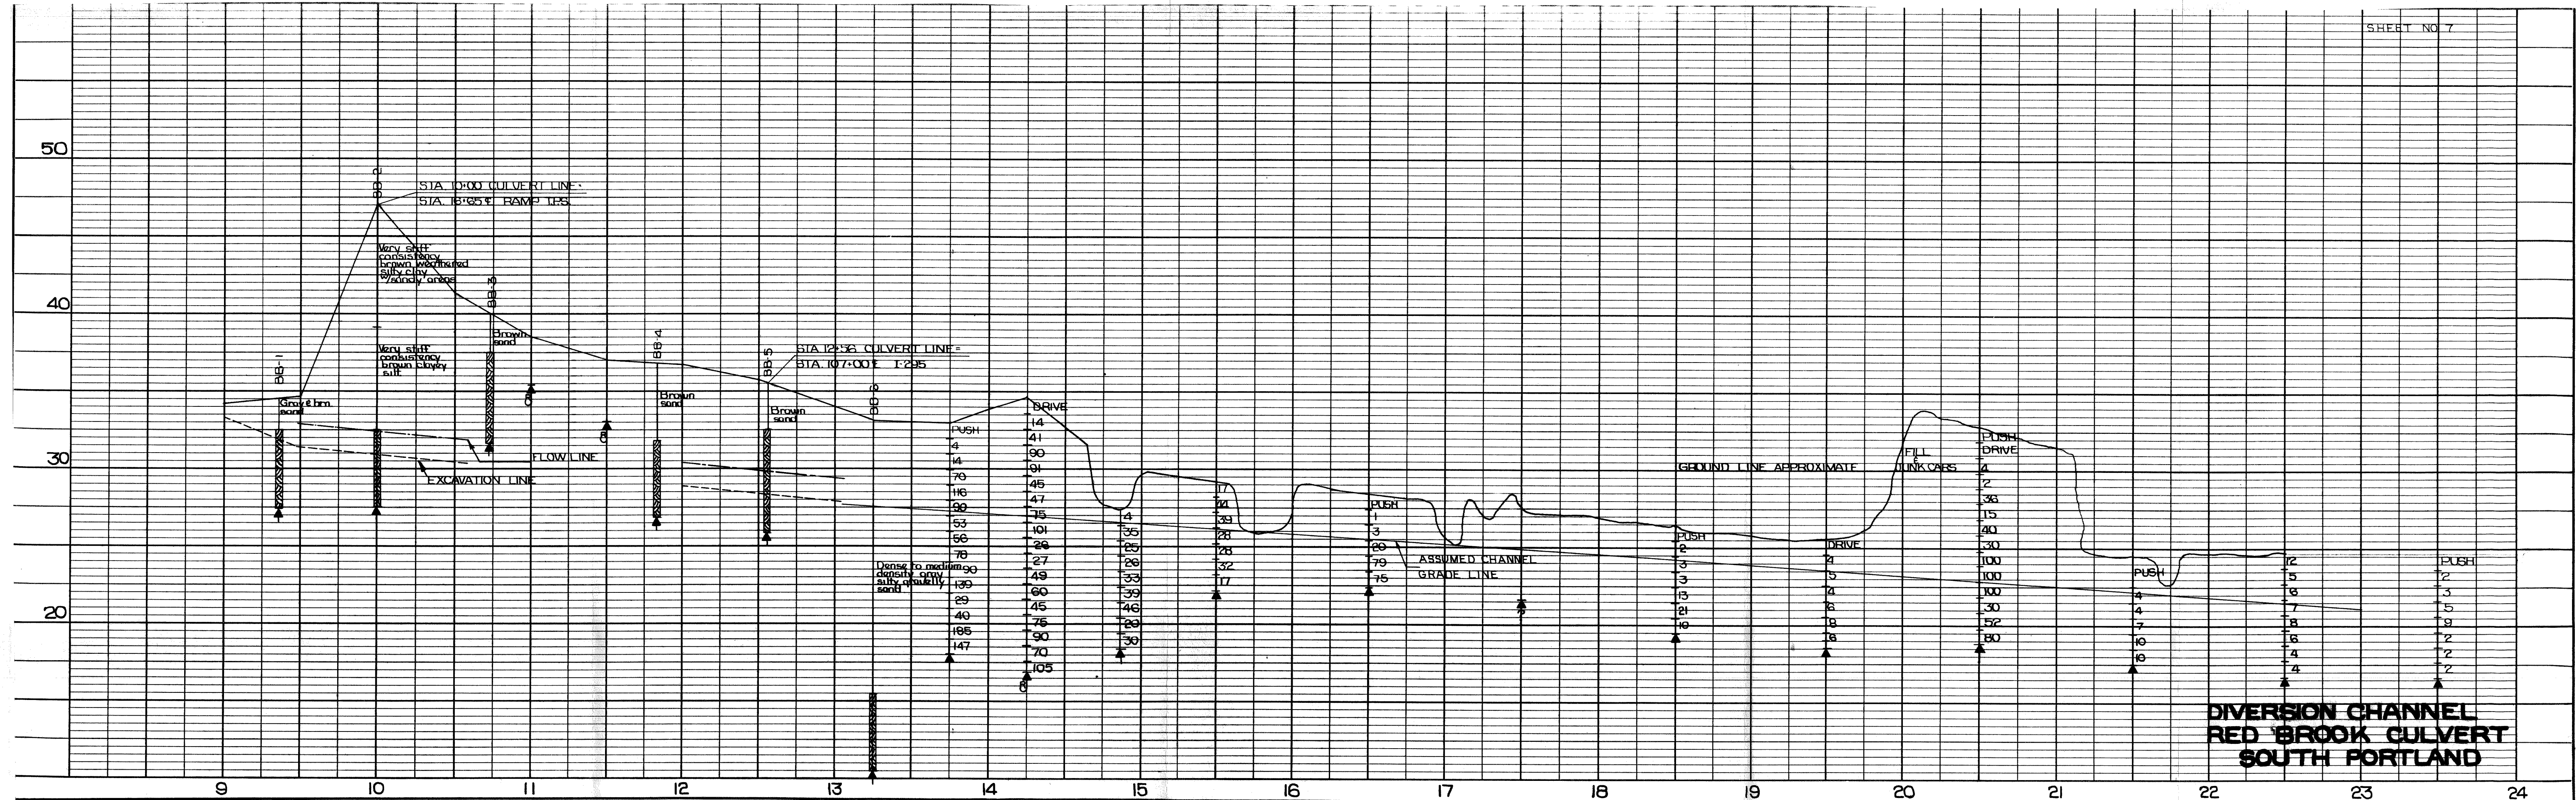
PLAN & PROFILE O. P. R. & R. E. STANDARD
